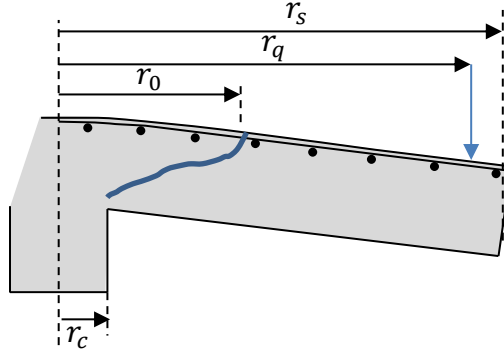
Geometrical parameters and rotation of slab (Adapted from Muttoni 2008)
